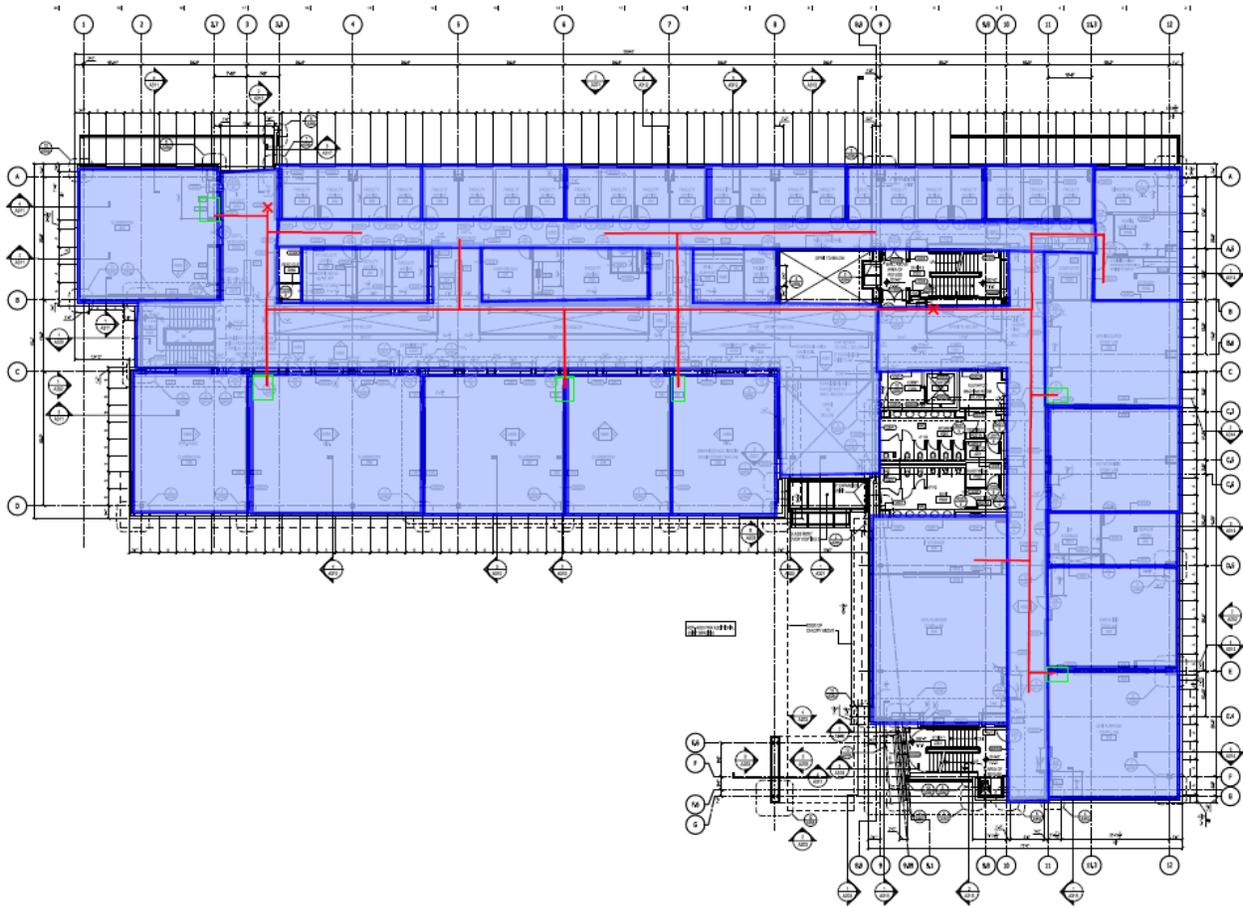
A diagram of the second floor HVAC zoning and piping distribution
